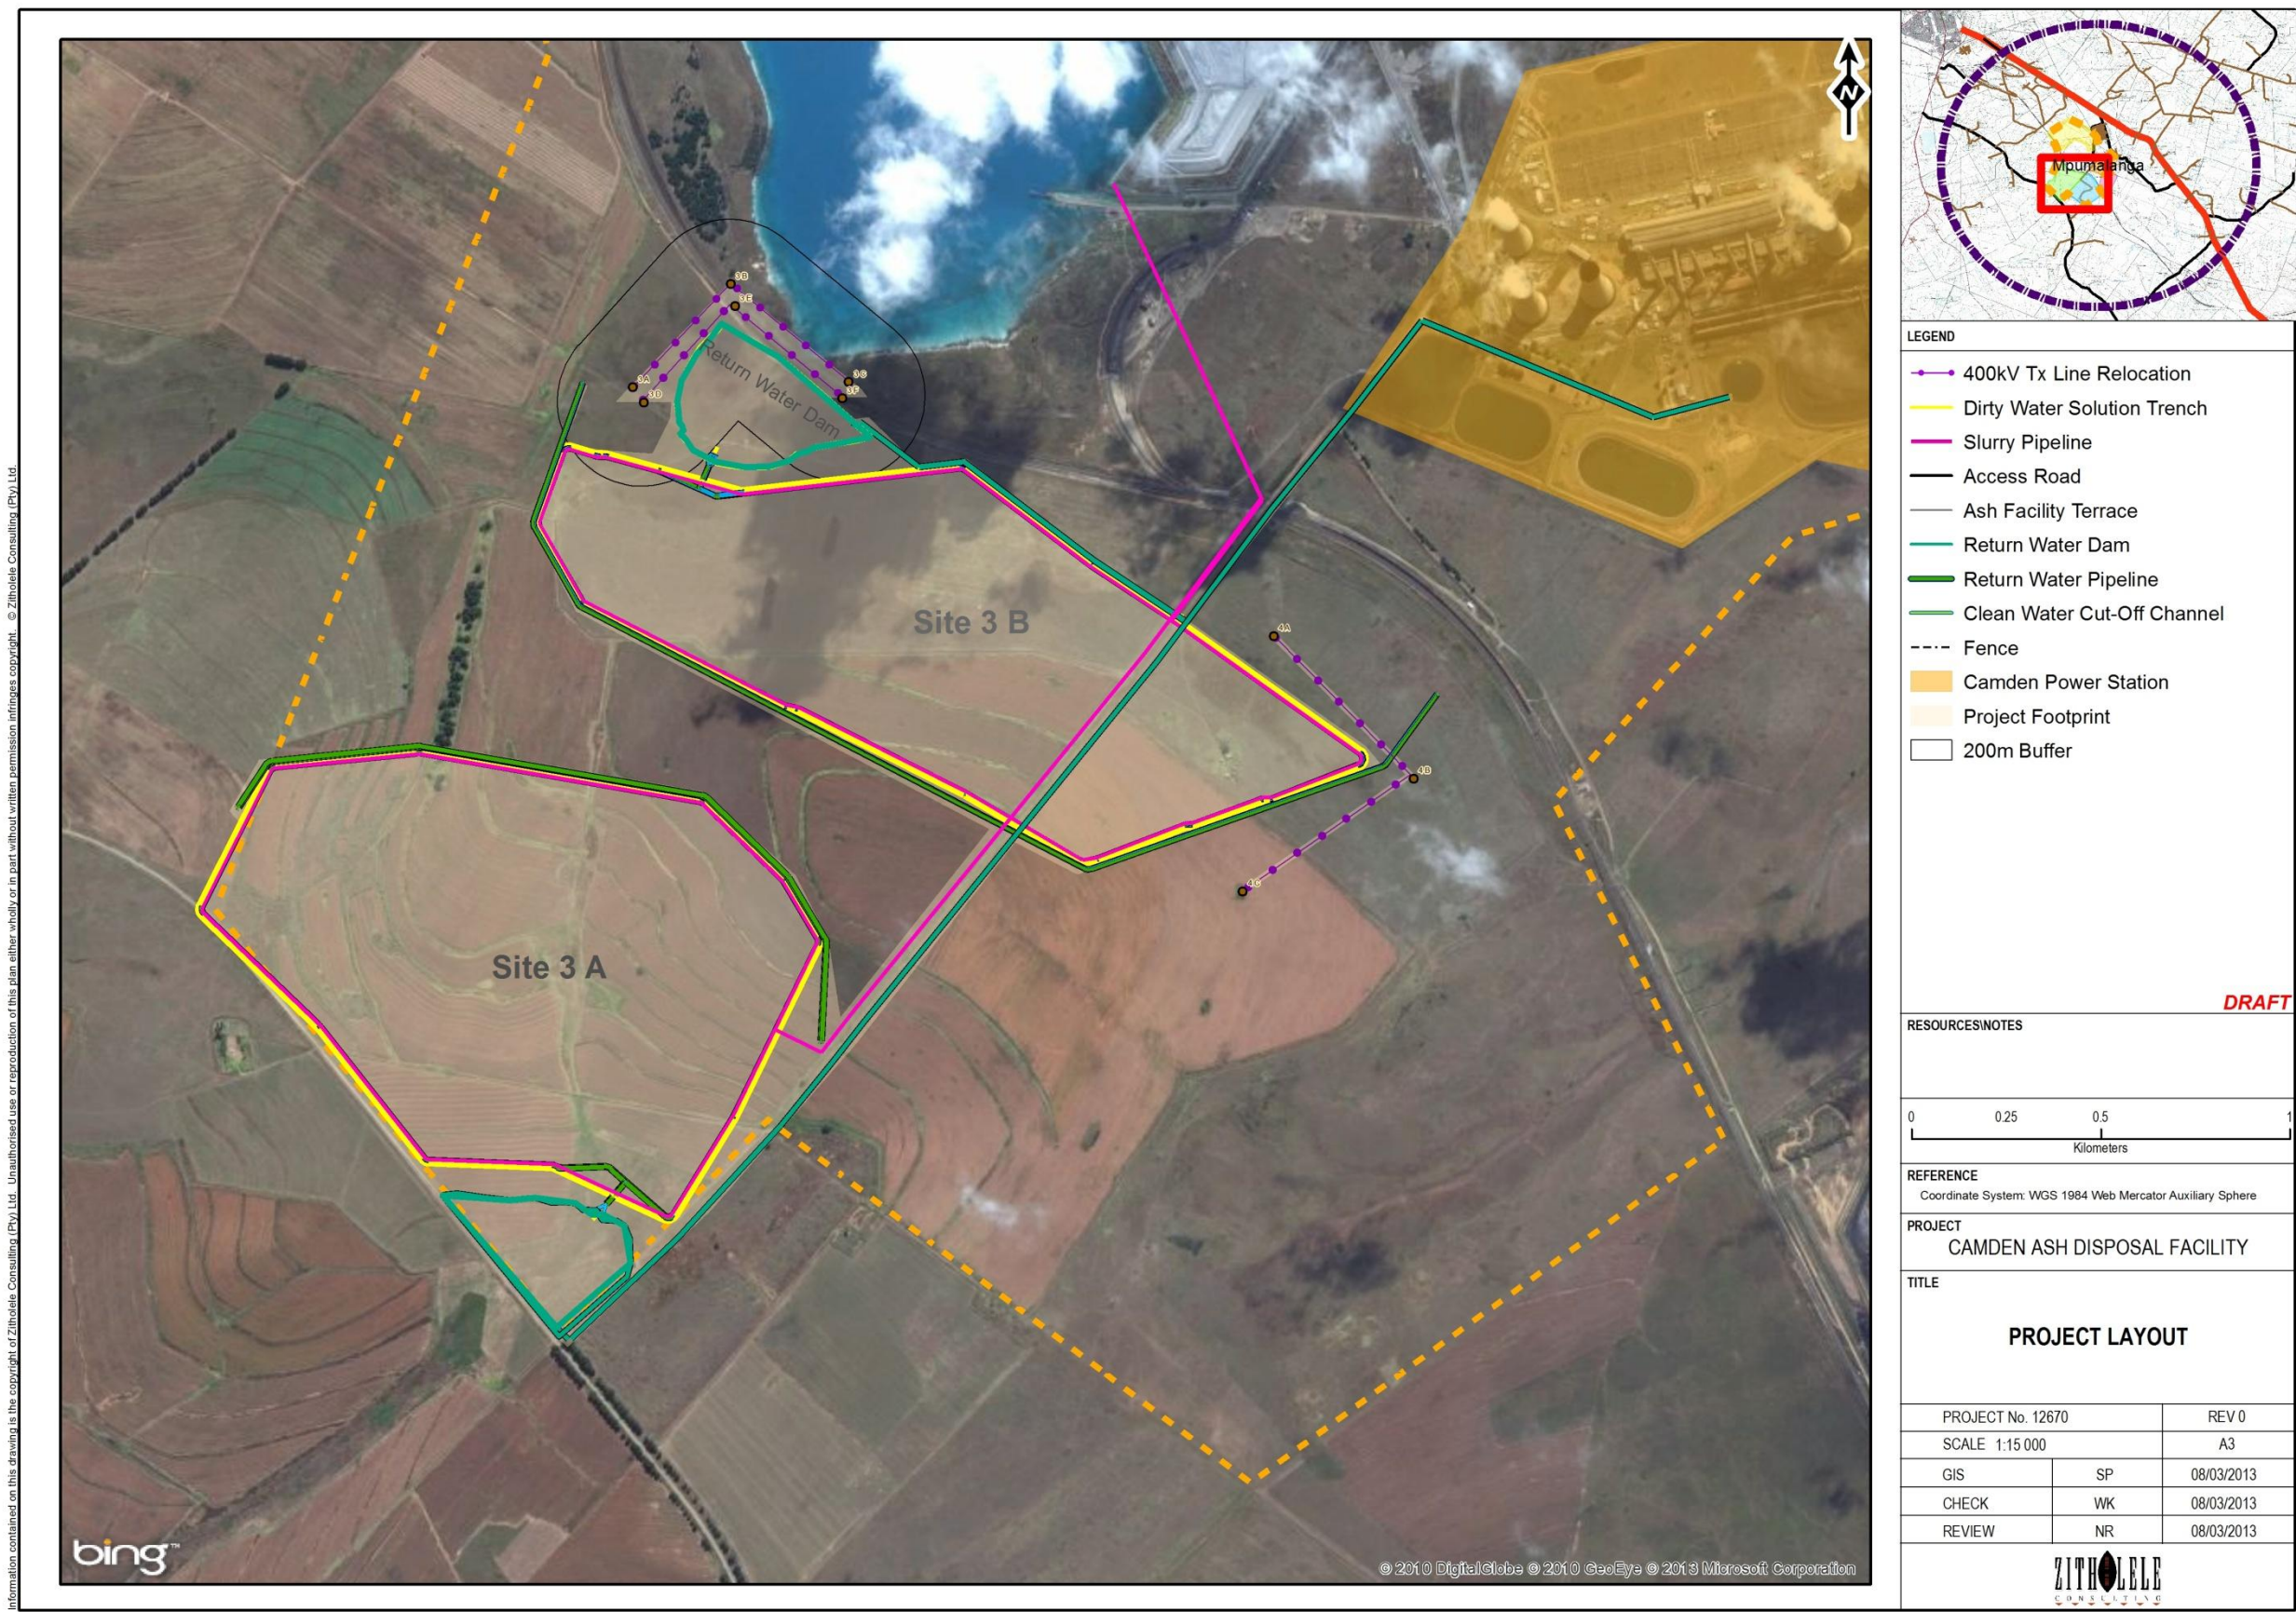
Camden Ash Disposal Facility Expansion Project Layout Map for Site 3
